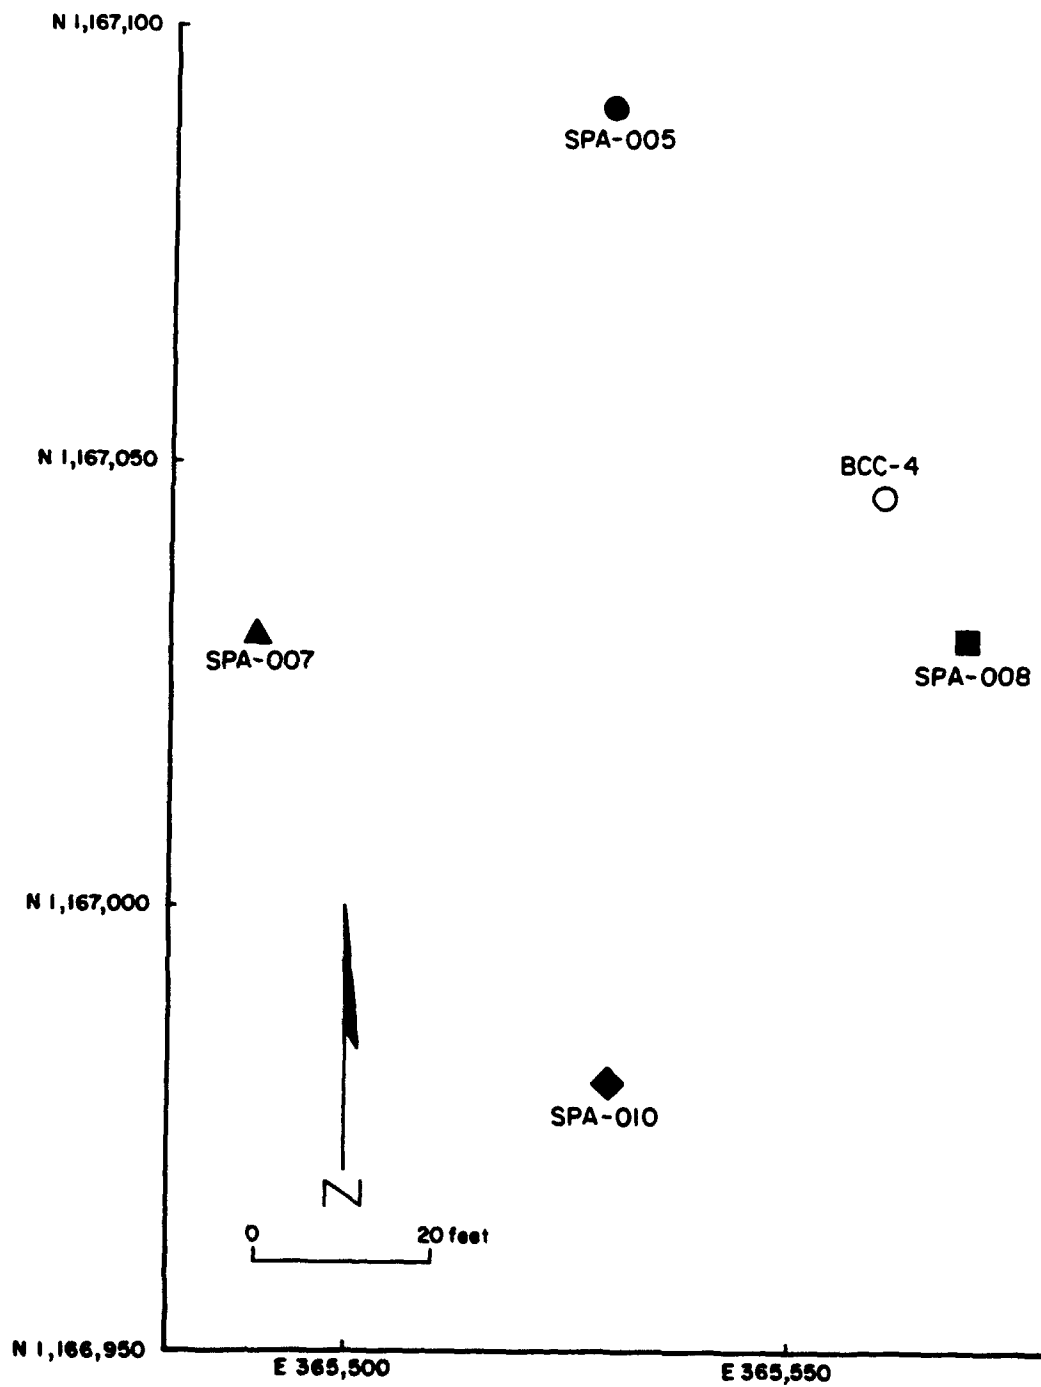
Plan View of Sector A Test Site at Jackson Lake Dam
